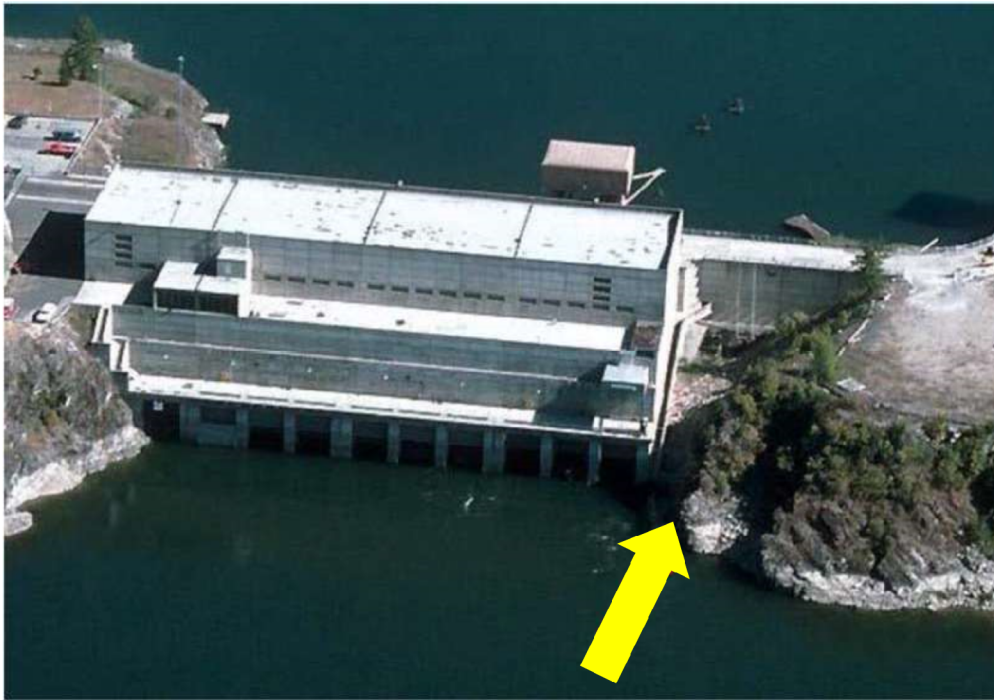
Location of the Proposed Entrance to the Facility (at the west side of the powerhouse)
